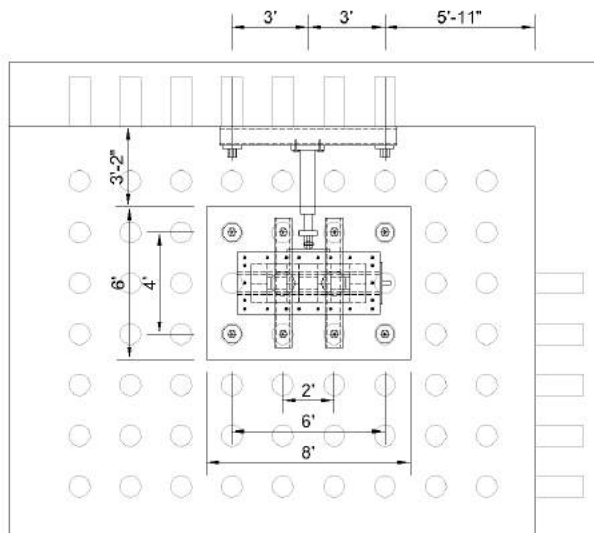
Proposed Test Setup for Specimen 1 and 3
